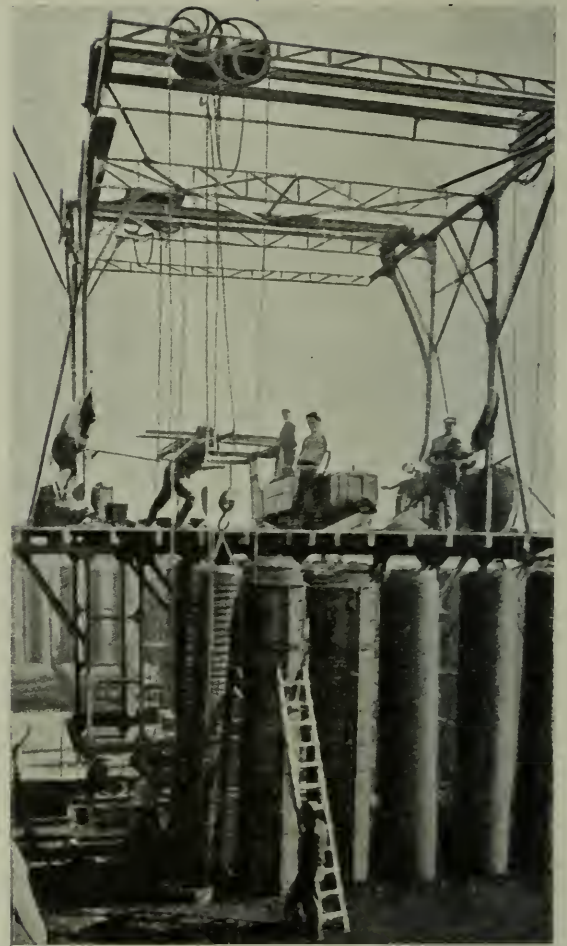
PLANT FOR CONCRETING AND HANDLING LONG TUBES.
